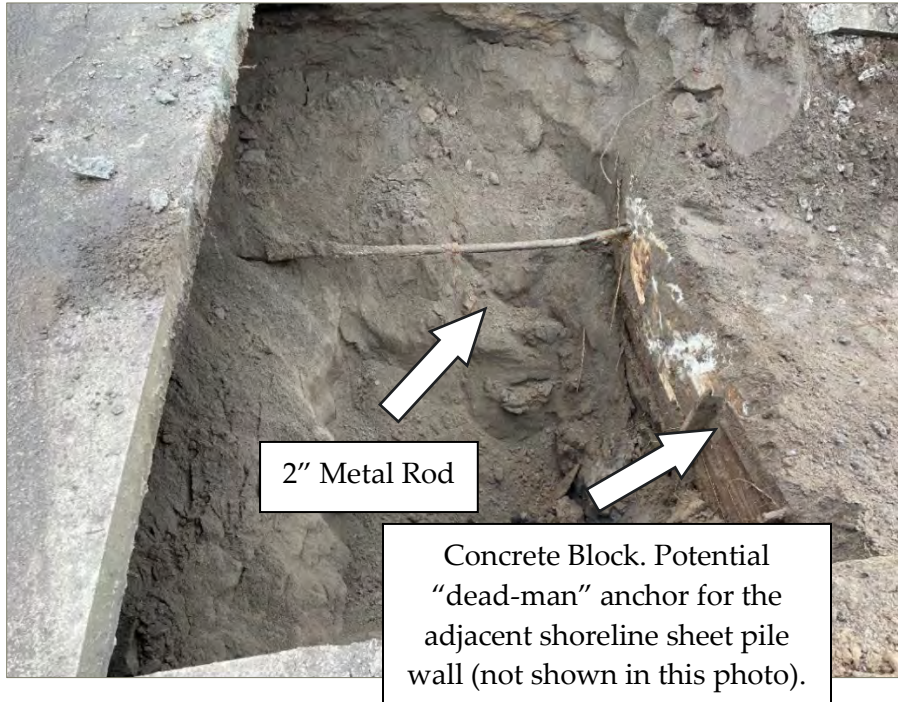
Area 8 – View of the West Half Final Extent of the Excavation. Photo taken on October 5, 2021. View direction is north. A metal rod and concrete block were observed in the excavation and are potential structural components of the adjacent sheet pile wall.
